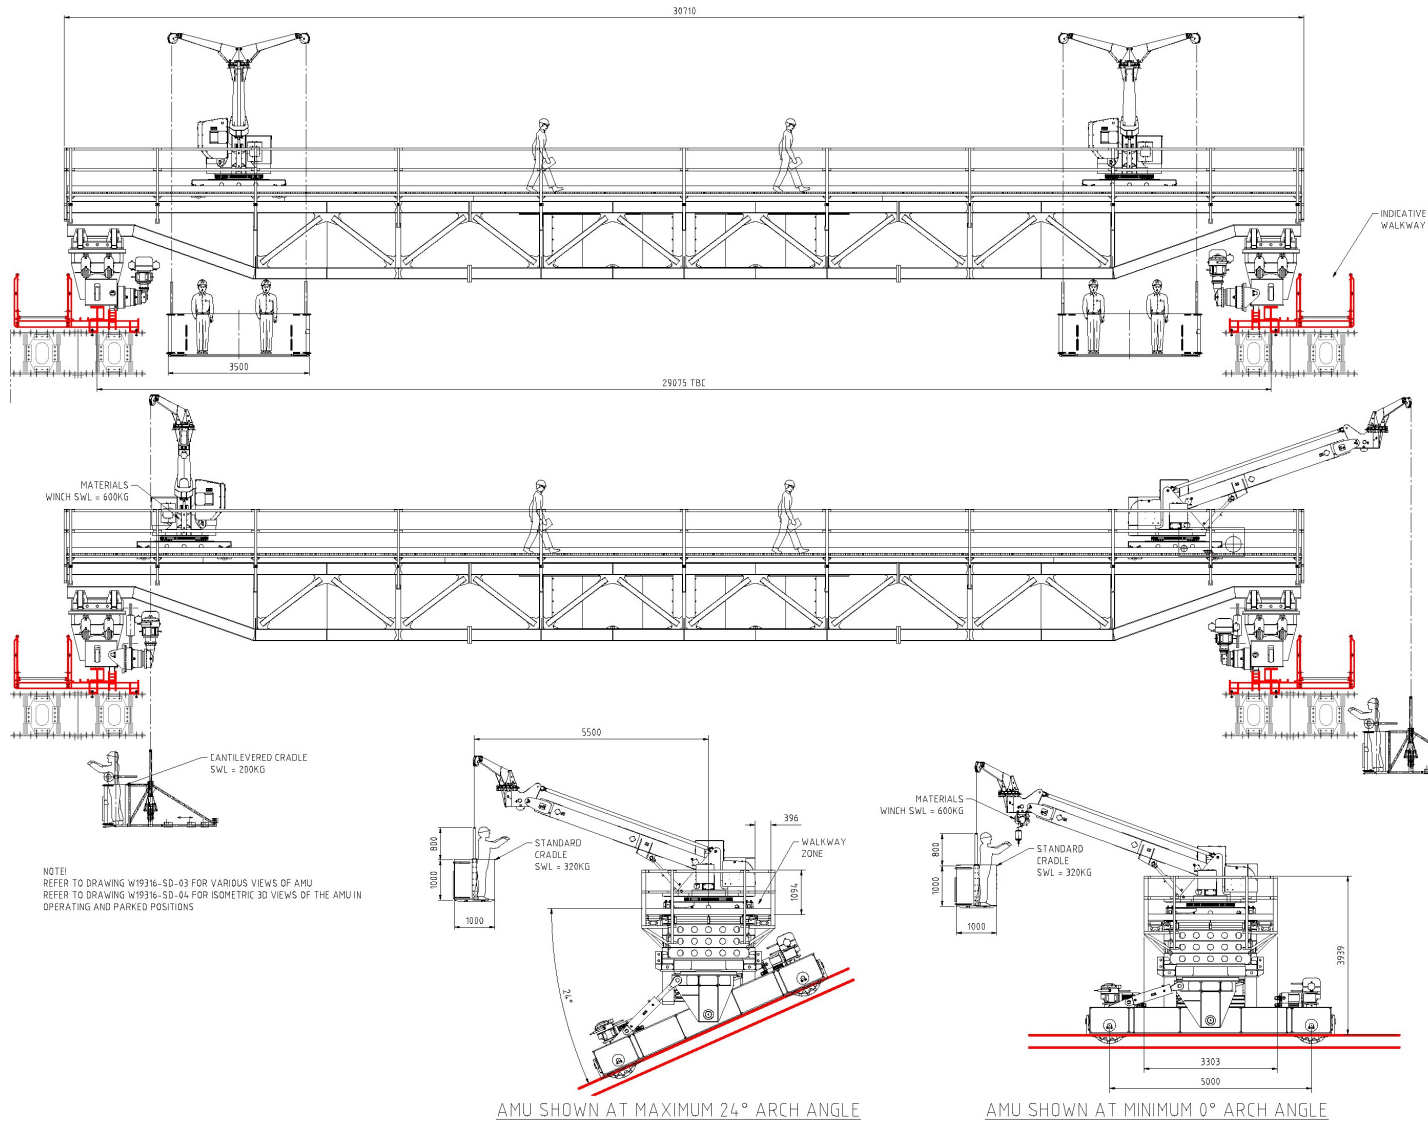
AMUs sections - indicative new walkways (Source: Mannetch)
